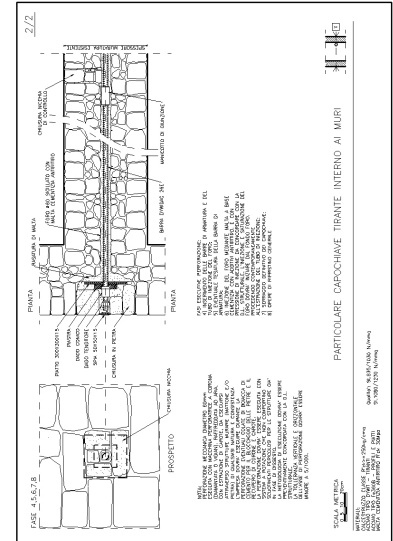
Detail of second step in tying two stone masonry walls together: the steel rod is inserted and the opening is filled with epoxy resin and grout.
